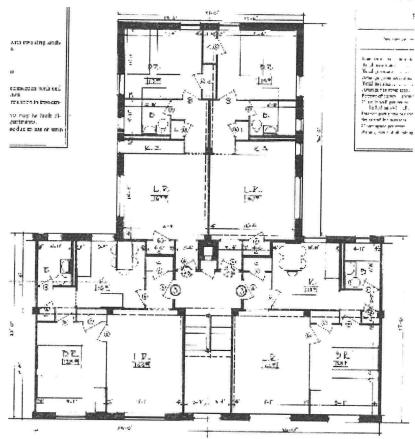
T-shaped plan. Note strip kitchens in the one-bedroom units. Housing Division Public Works Administration, *Unit Plans: Typical Room Arrangements*, Site Plans and Details for Low-Rent Housing (Washington D.C. GPO, May 1935), HD-
